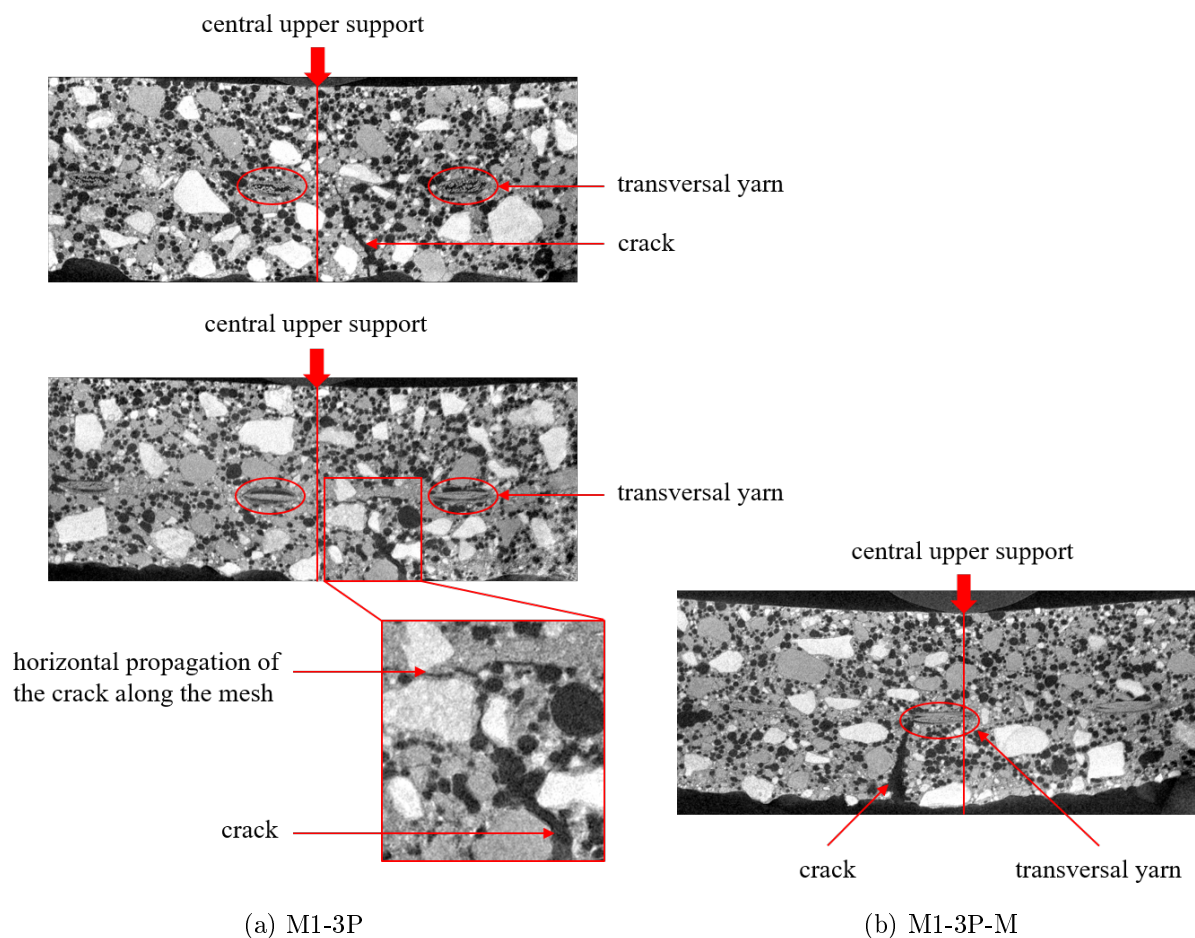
Vertical sections inside the reconstructed volume of the cracked samples (a) M1-3P and (b) M1-3P-M.
